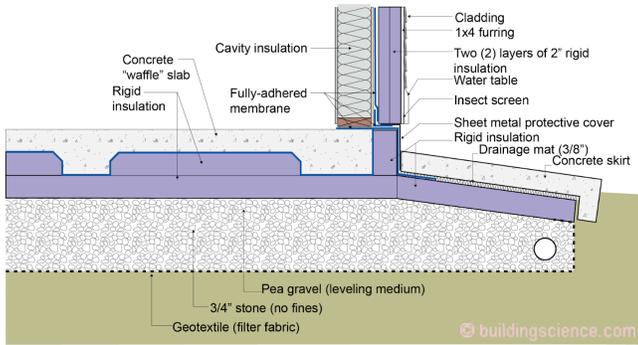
Shallow Frost Protected Foundation - Rigid horizontal insulation protected by a concrete “skirt” as well as a fully adhered membrane and a strip of aluminum or alternatively a strip of cellular PVC
